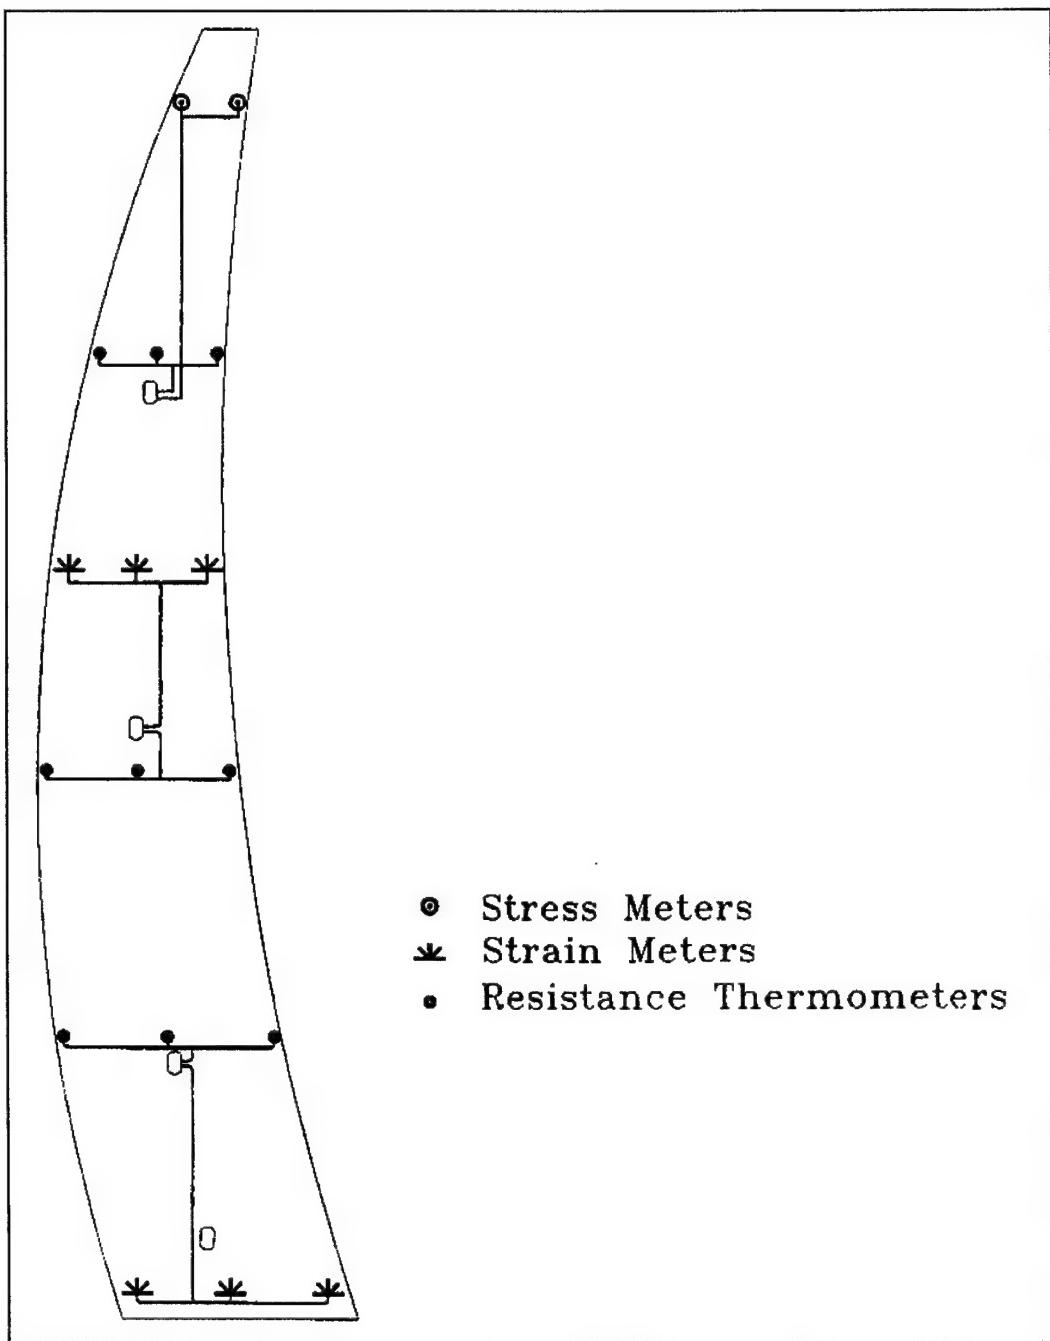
Recommended location of embedded instrumentation in arch dam (section at crown cantilever)
